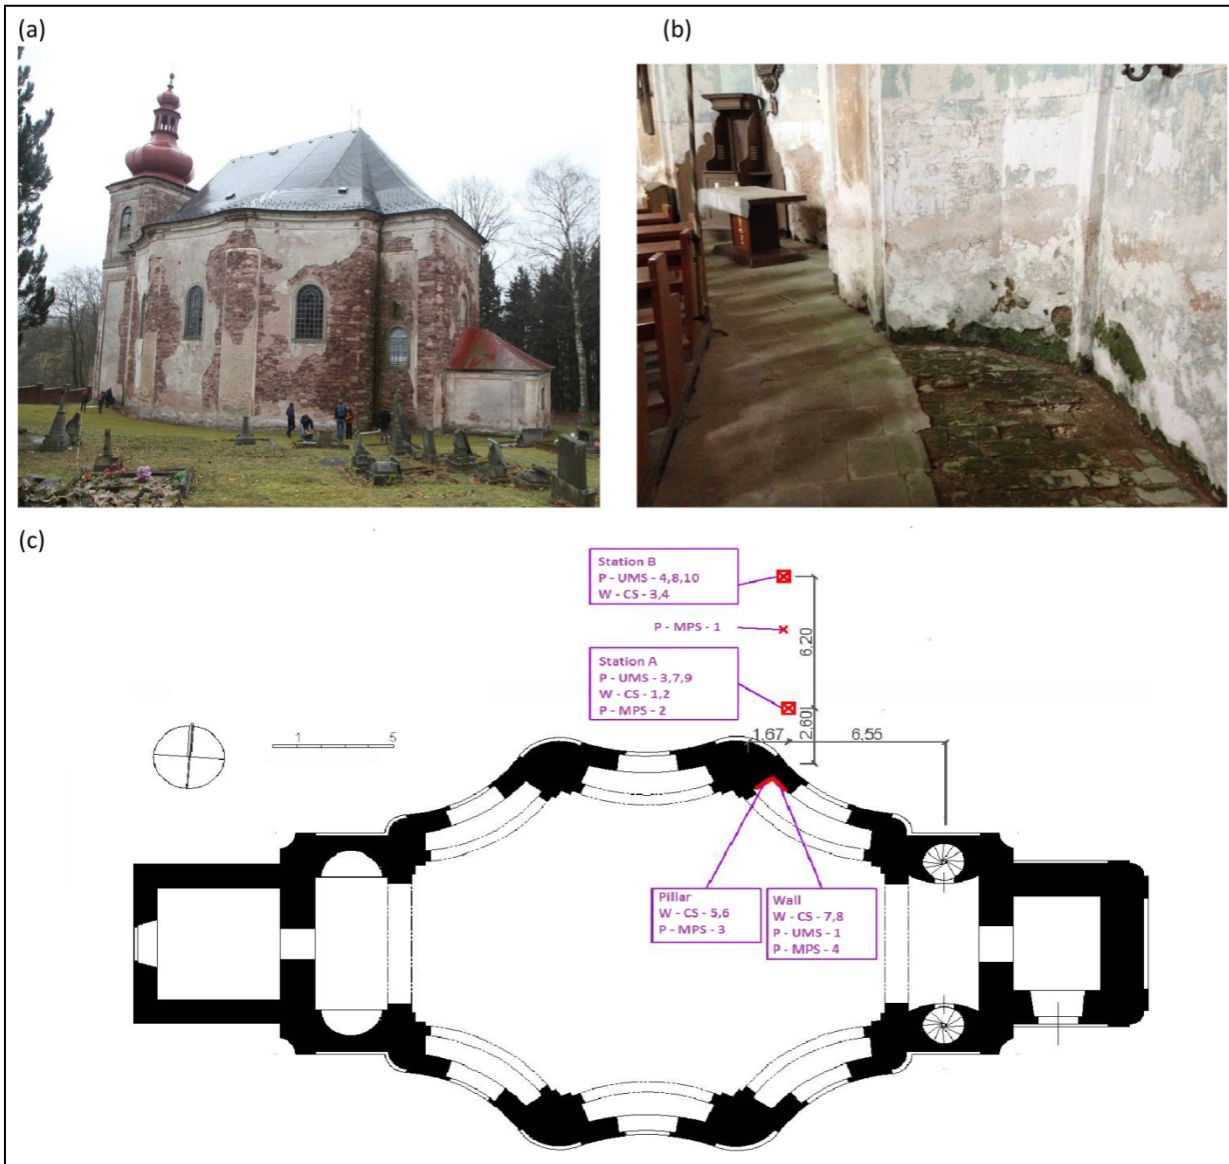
Church of All Saints in Hermánkovice: (a) north facade; (b) church interior; (c) location of the monitoring system. [23]
